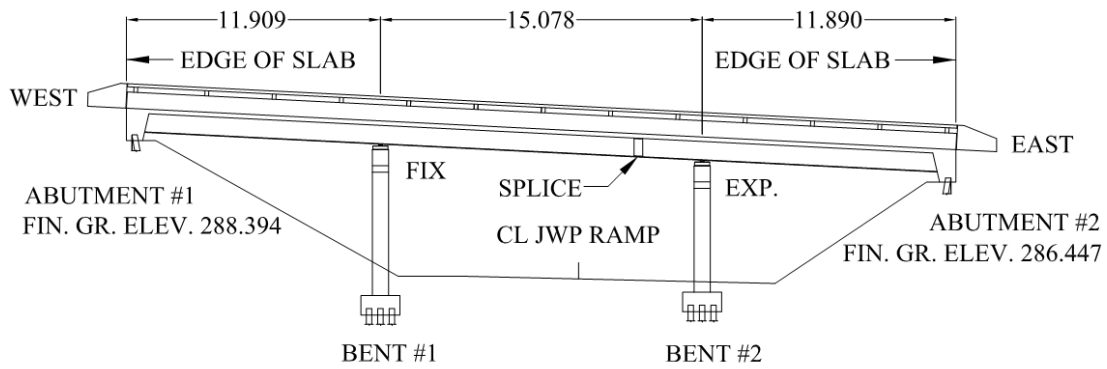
5th Avenue over James White Parkway: elevation (m)
